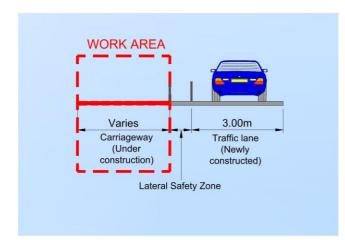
Traffic Management Cross Section, Section 2a – Stage 2b
